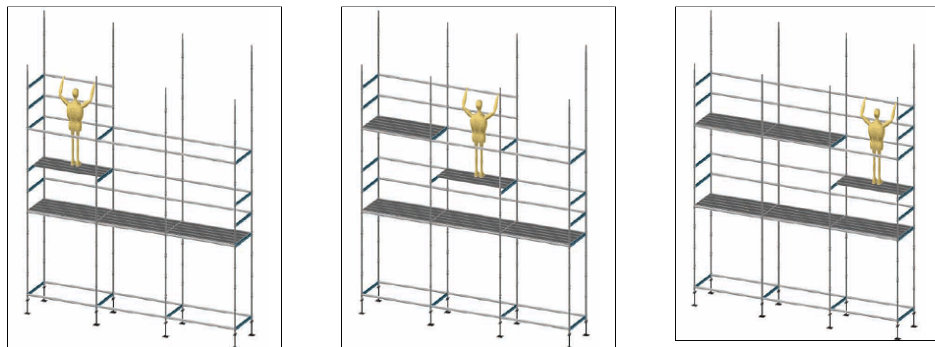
Tunnelling (progressive guardrail) installation method. A safe zone is created when there is a fully boarded and correctly supported platform without gaps where someone could fall, and with a single guardrail between 900-1100 mm above the platform.
